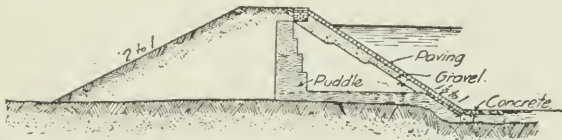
Section of Reservoir Embankment, Brooklyn.
